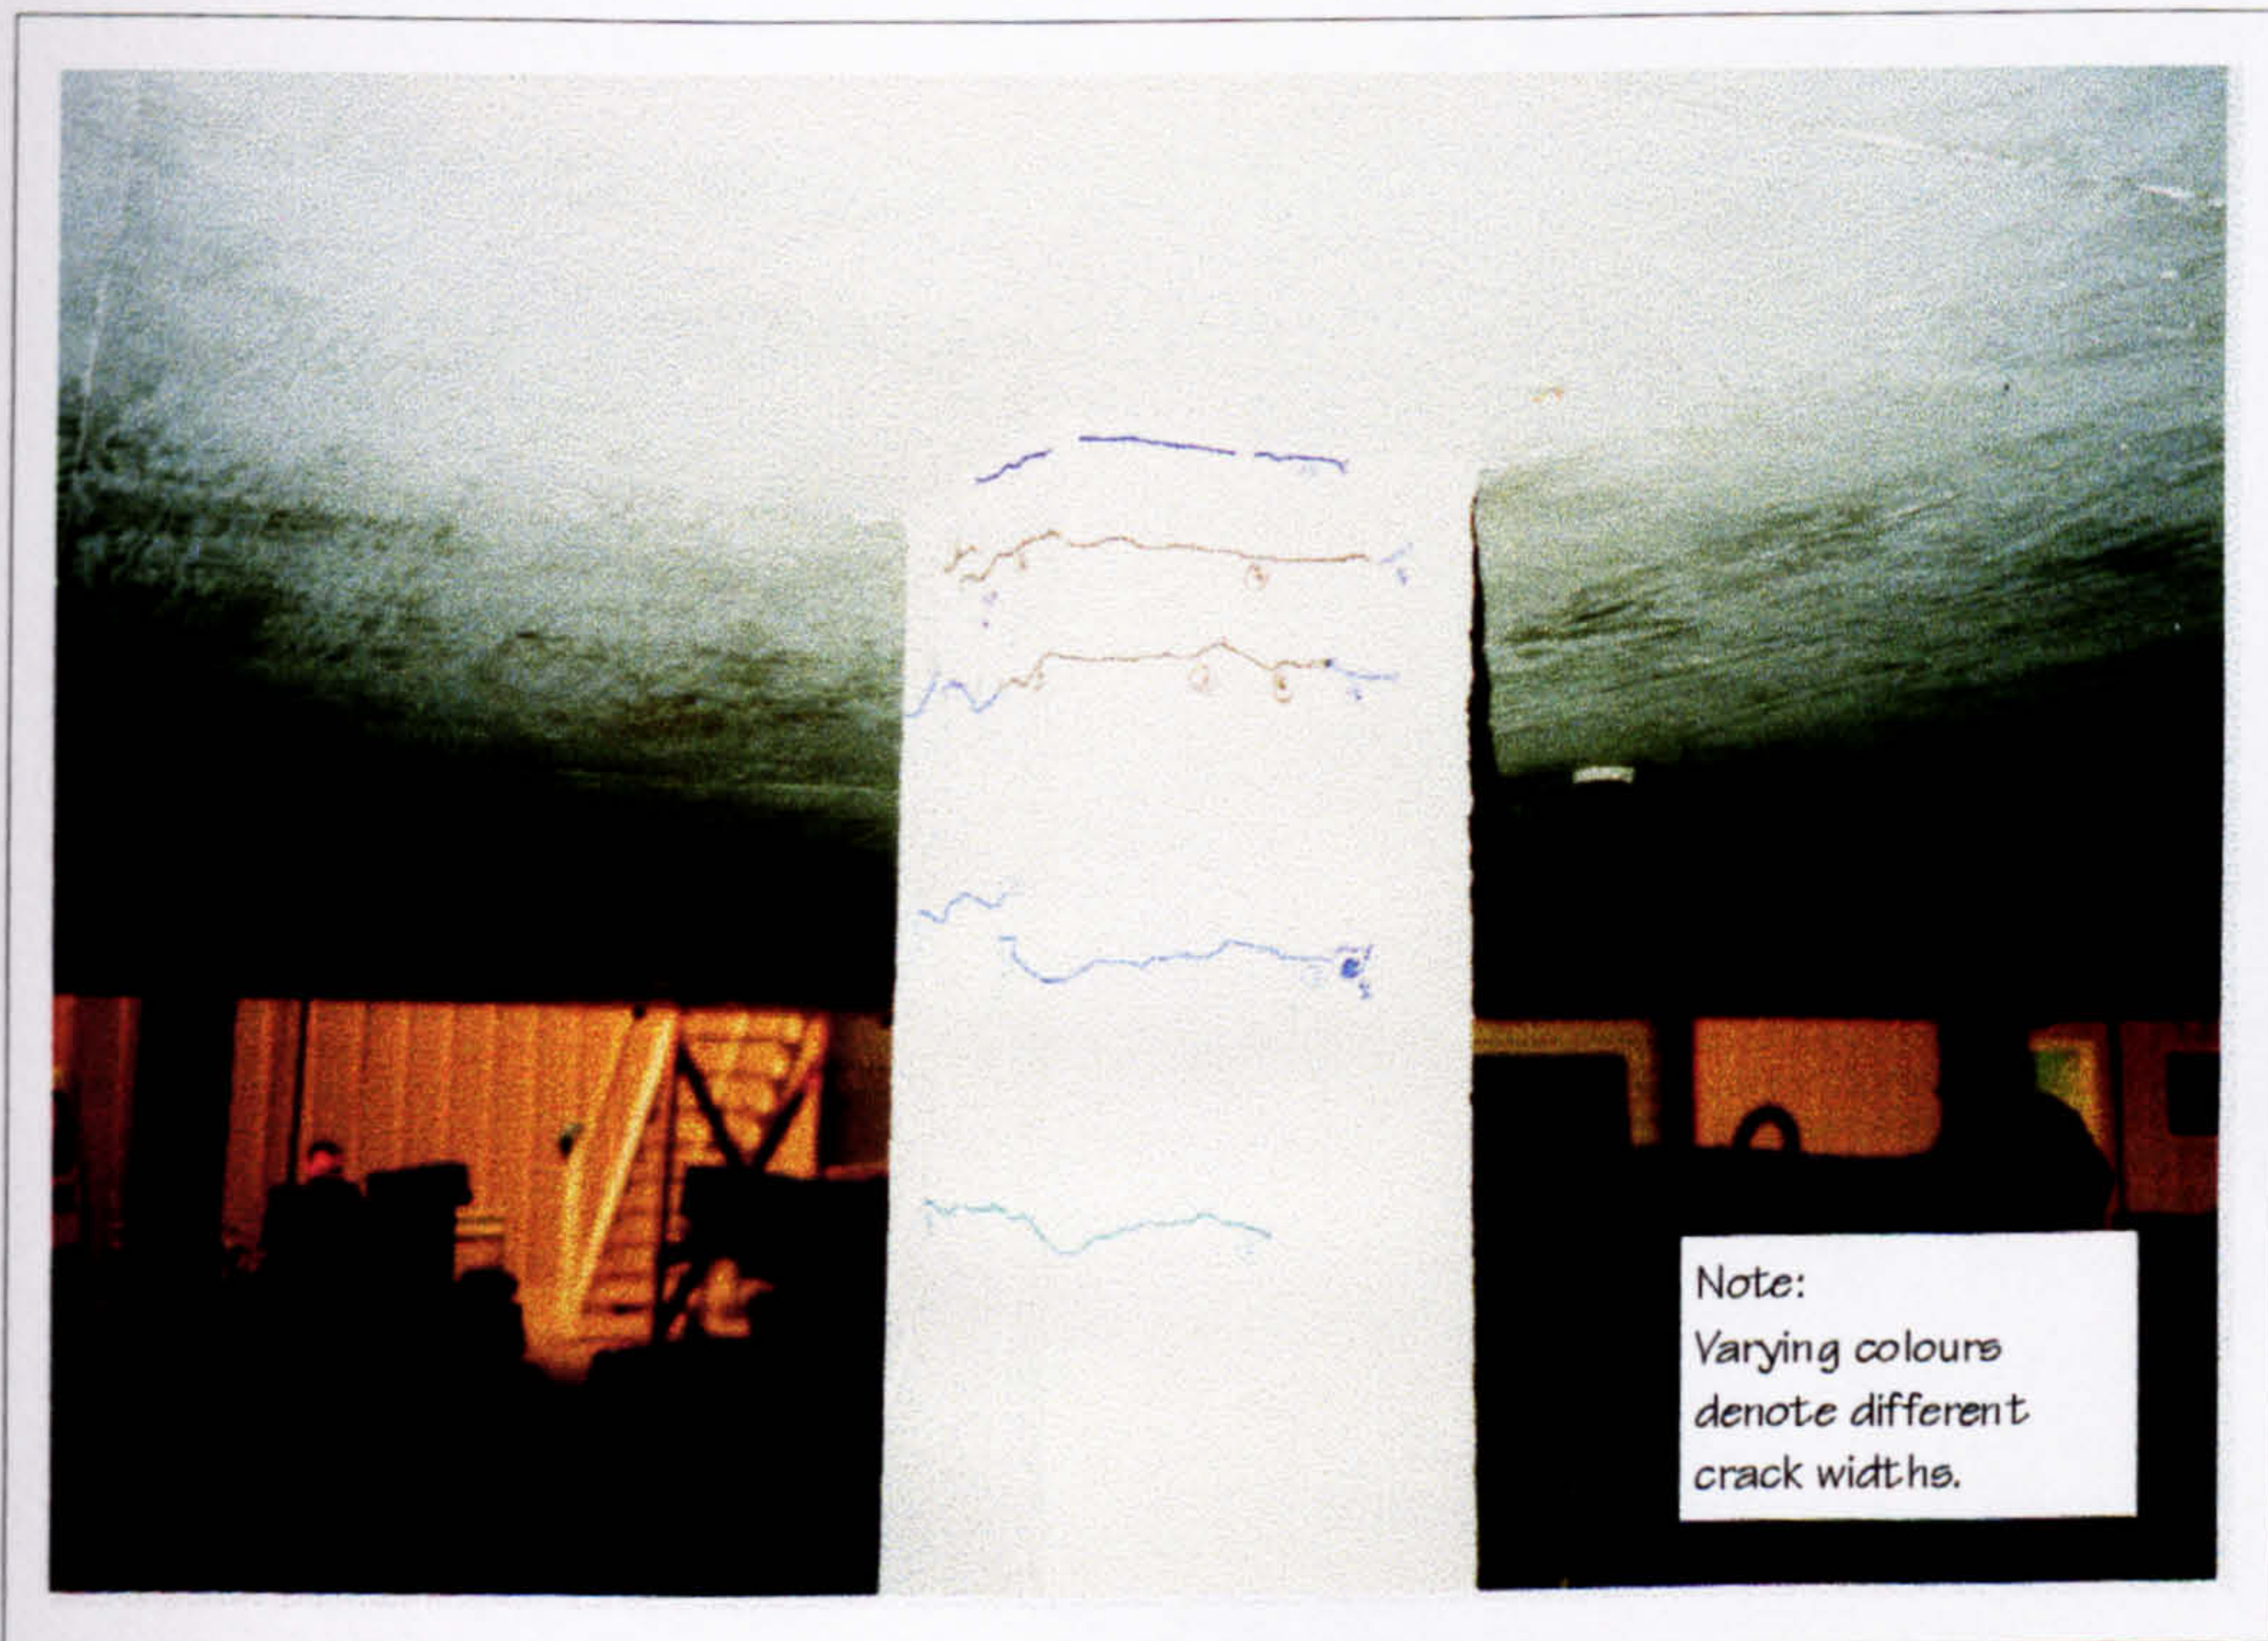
Structure B (Cracked) - Cracking in column C2 looking from the North.
